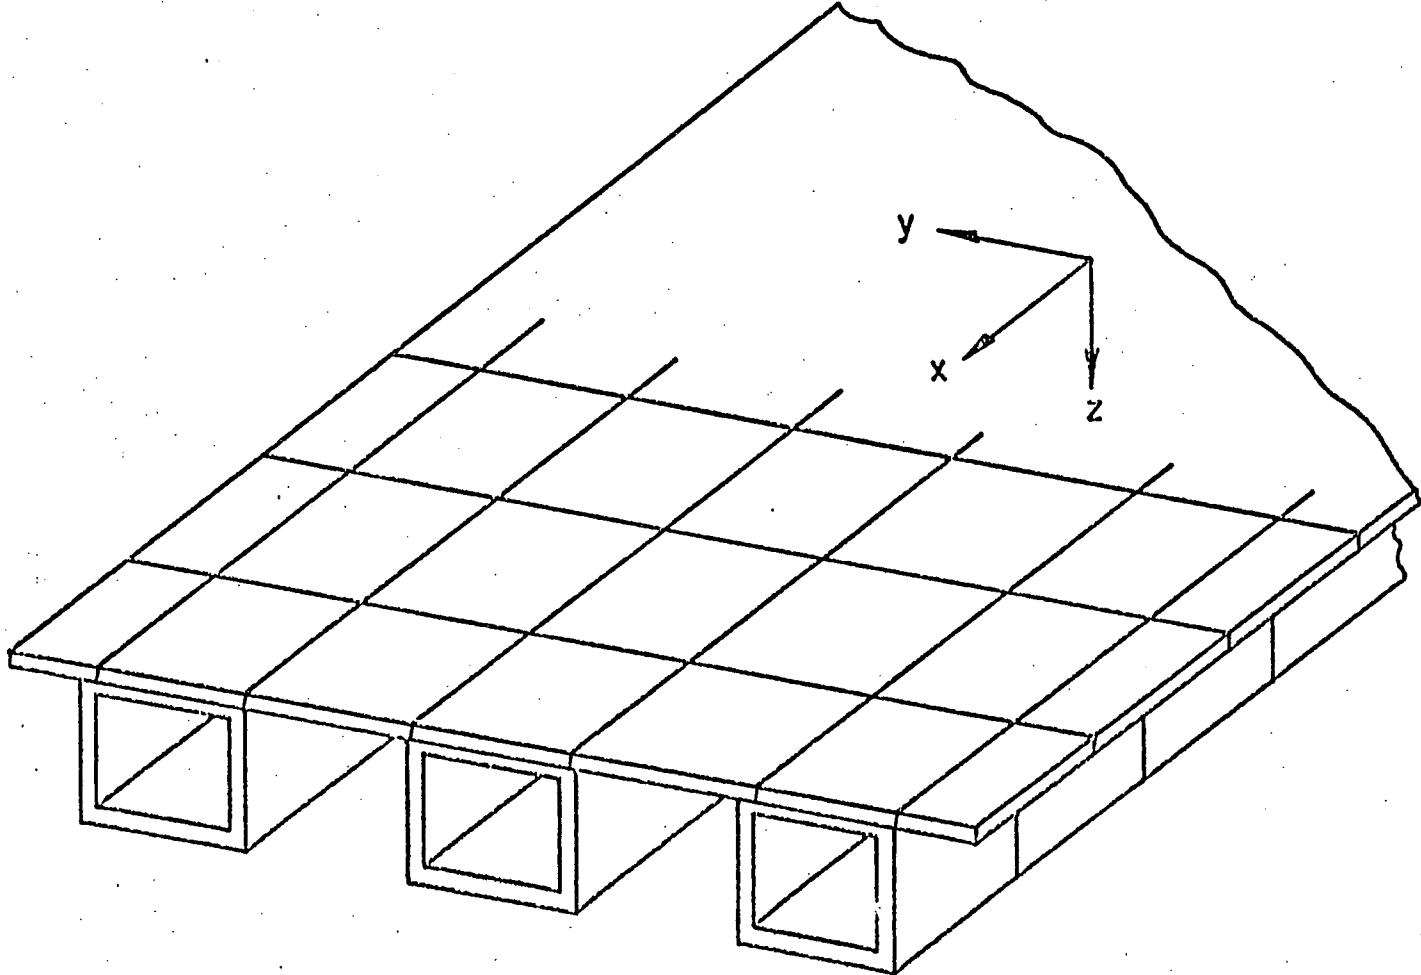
Finite Element Discretization of a Prestressed Concrete Spread Box-Beam Bridge
